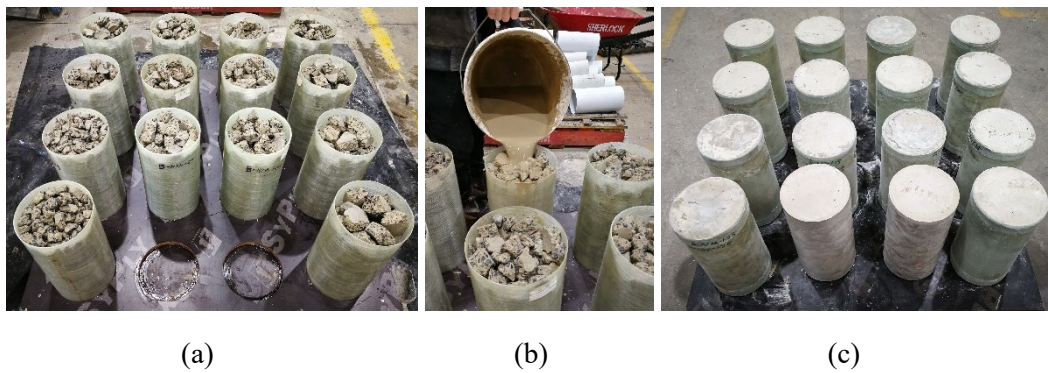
Preparation of specimens: (a) filling FRP tubes with RCLs; (b) pouring grout; (c) curing of test specimens.
